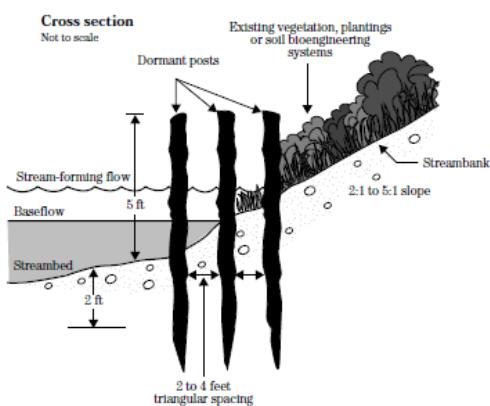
Typical cross-section of a dormant post planting project (USDA, 1996).
